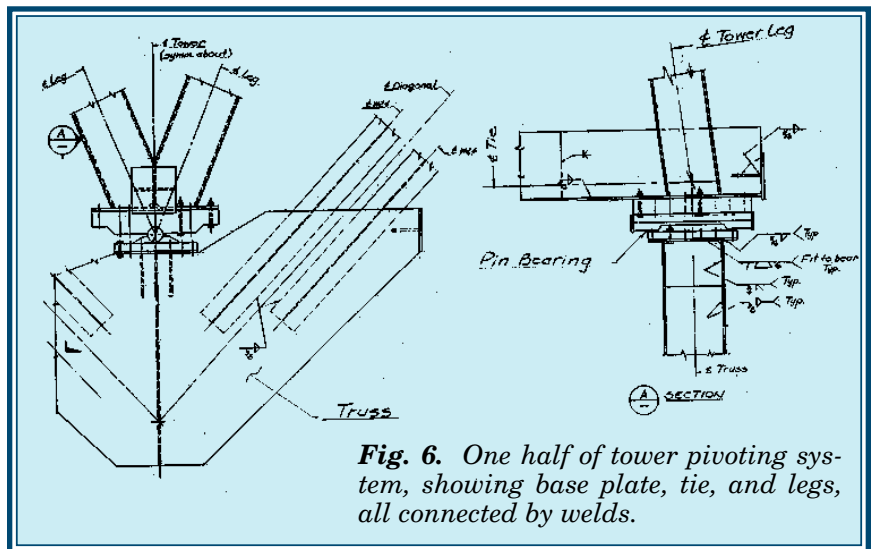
One half of tower pivoting system, showing base plate, tie, and legs, all connected by welds.
